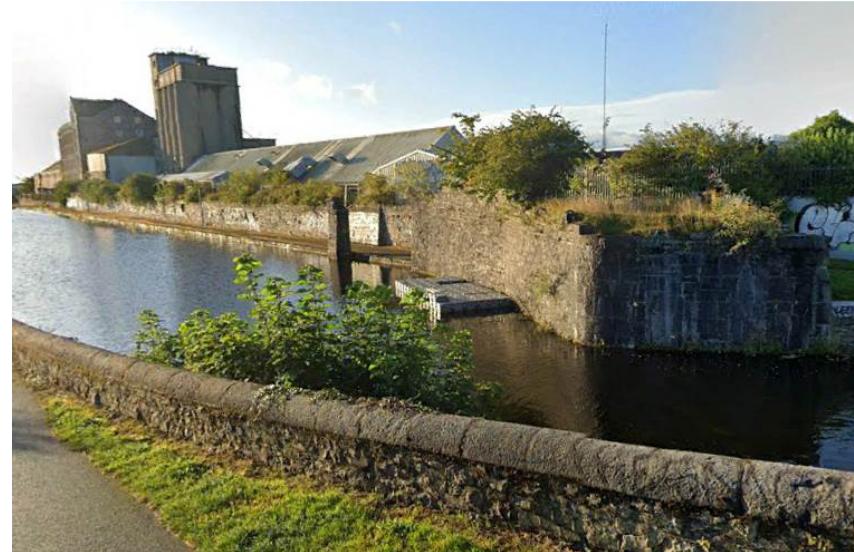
Remains of railway bridge that formerly accessed the proposed development area, facing southeast (Google Street View)
